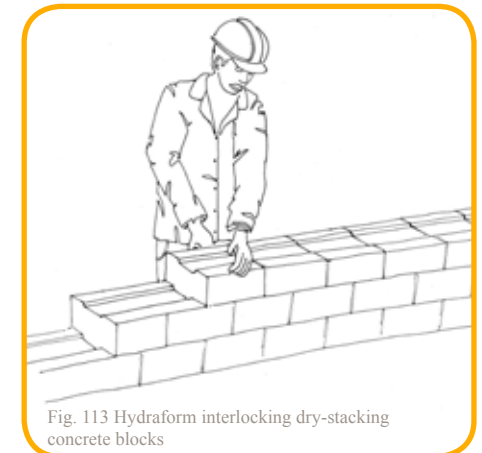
Hydraform interlocking dry-stacking concrete blocks
